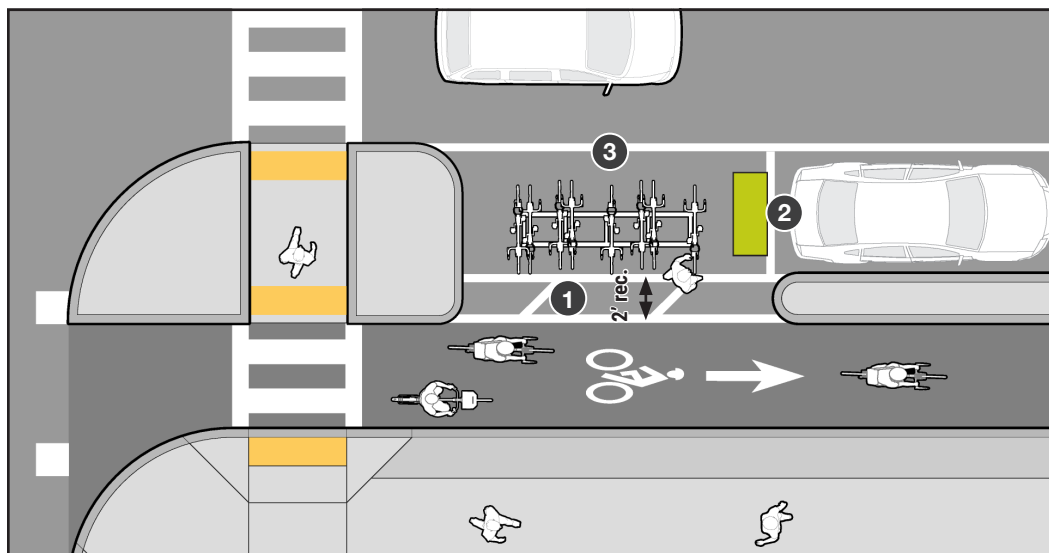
G: ON-STREET BIKE PARKING (INTERSECTION)
